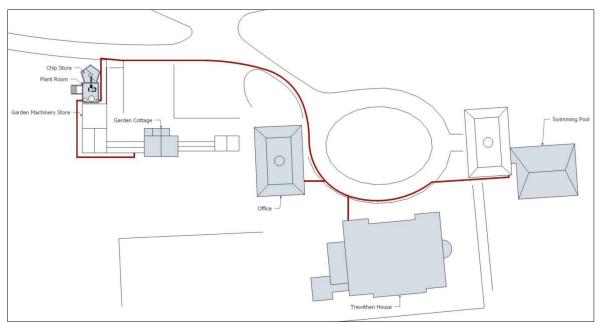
Plan showing the location of the proposed building and associated trenching (courtesy of Cleanearth Energy, dwg no. CE200090-101-03).
